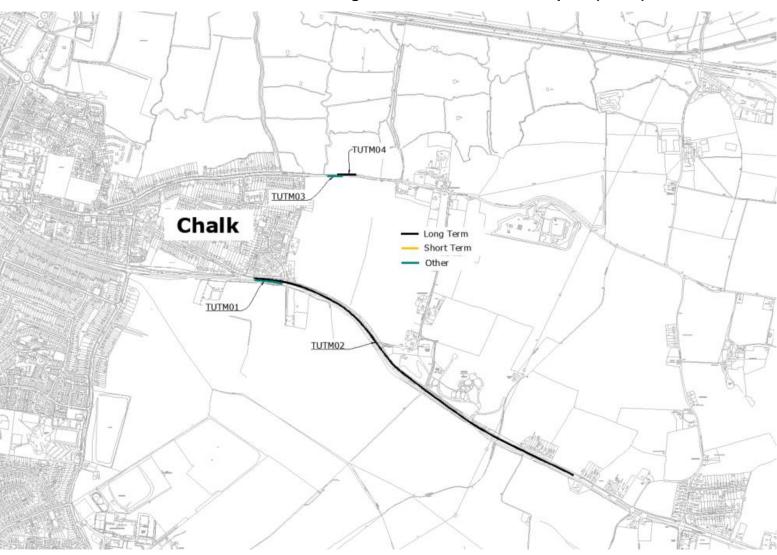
Tunnel traffic management measures location plan (1 of 2)
